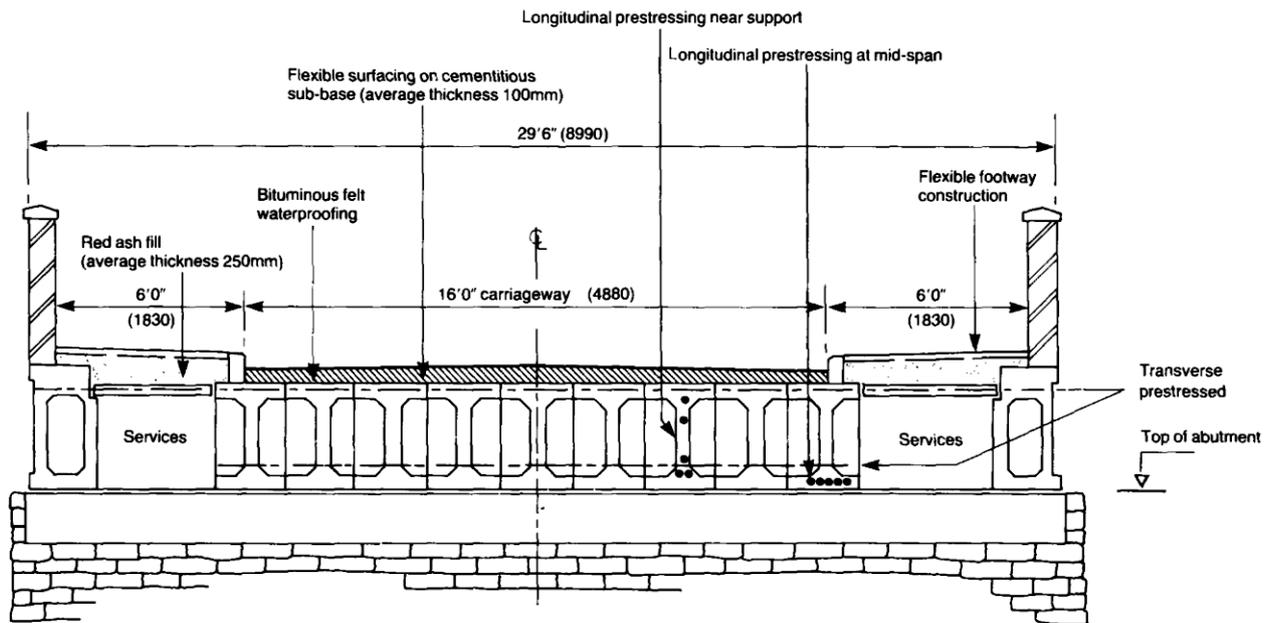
Cross section of Ynys-y-Gwas bridge (Woodward and Williams, 1988).
